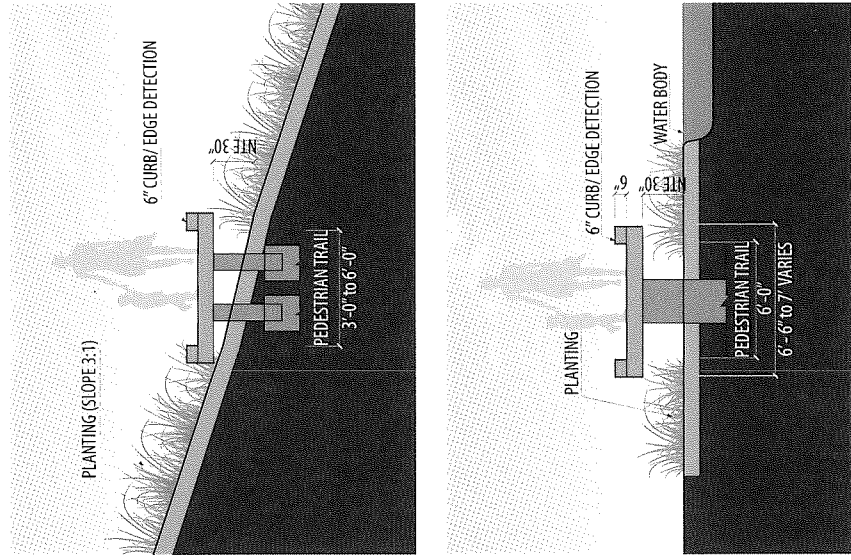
Trail Sections - Type E: Elevated Boardwalk
